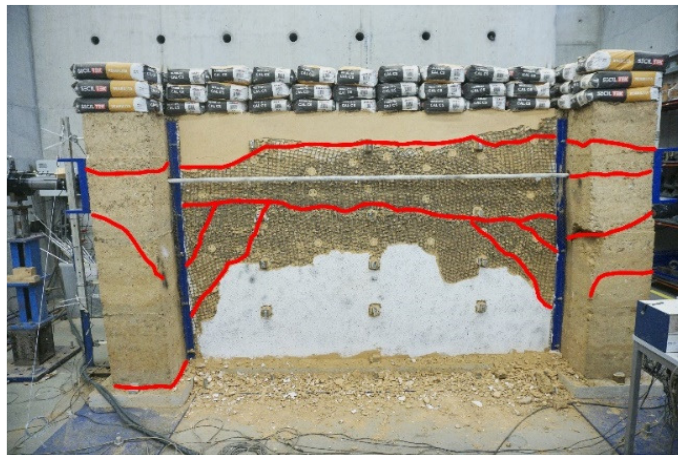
Crack pattern of the GeoRE-IP wall.
